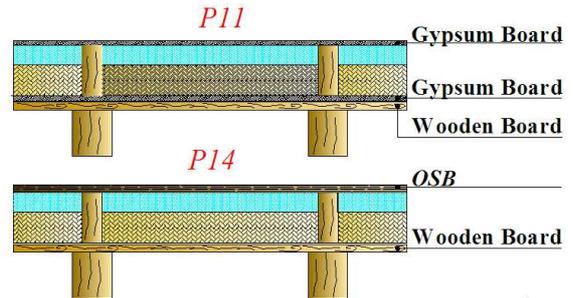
The retaining system: P14 OSB2 panel, P11 two gypsum board layers
